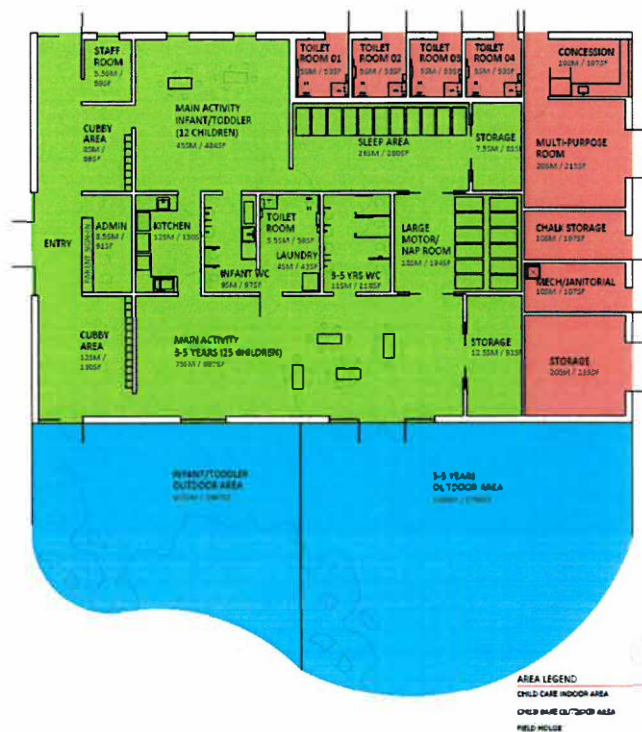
Eldon Park Field House and Child Care Facility Conceptual Floor Plan
